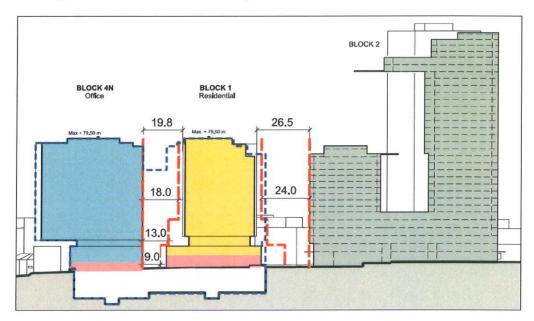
Setbacks to adjoining buildings should Block 1 be modified to residential and retail uses (Source: Proponent's amended application)
